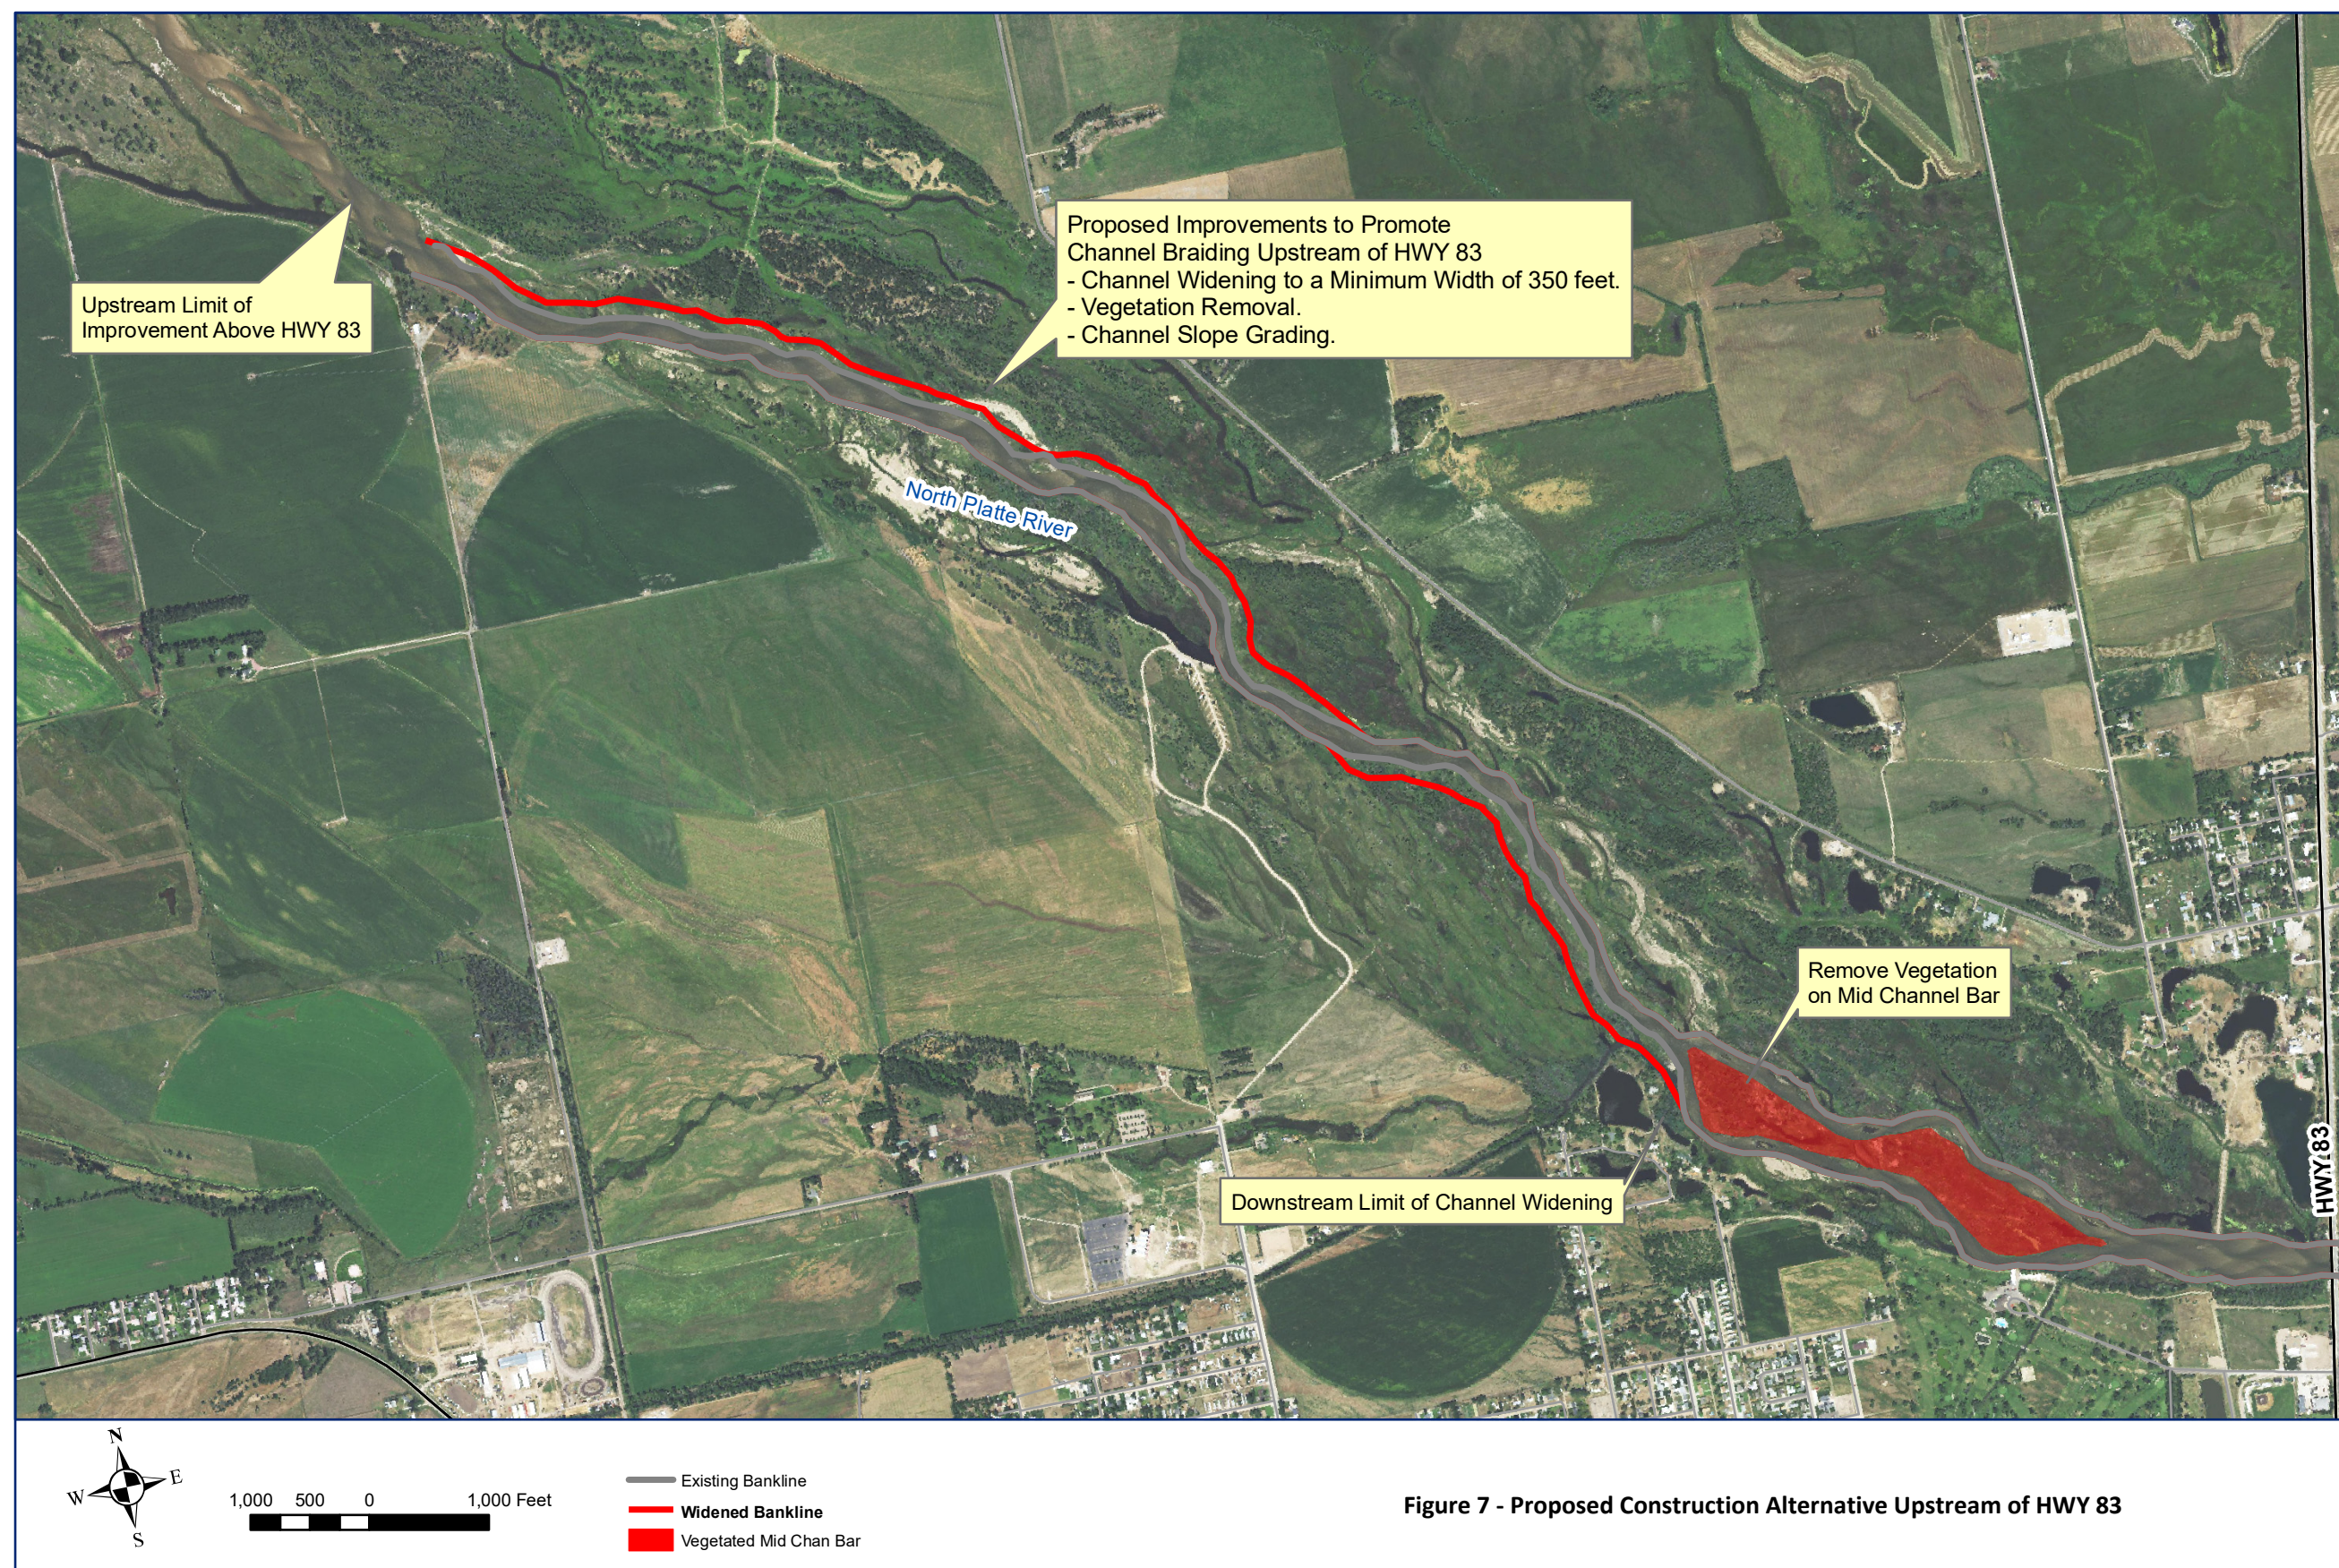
Proposed Construction Alternative Upstream of HWY 83
